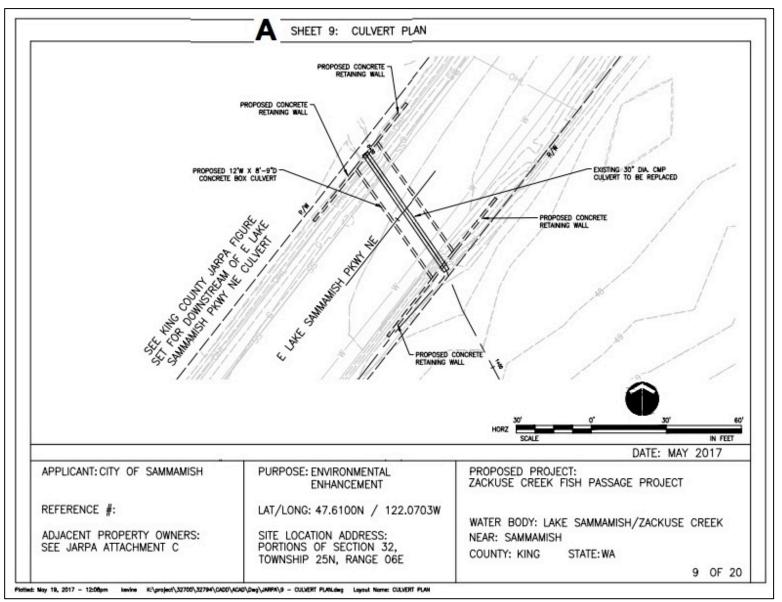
Project plans – culvert plan, provided by Otak, Inc.
